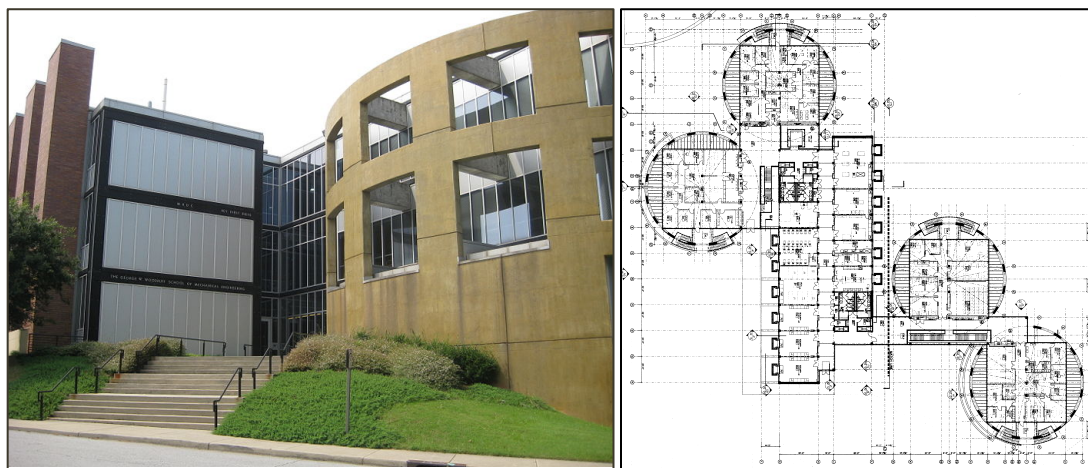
Elevation and typical floor plan of the first case building: MRDC
